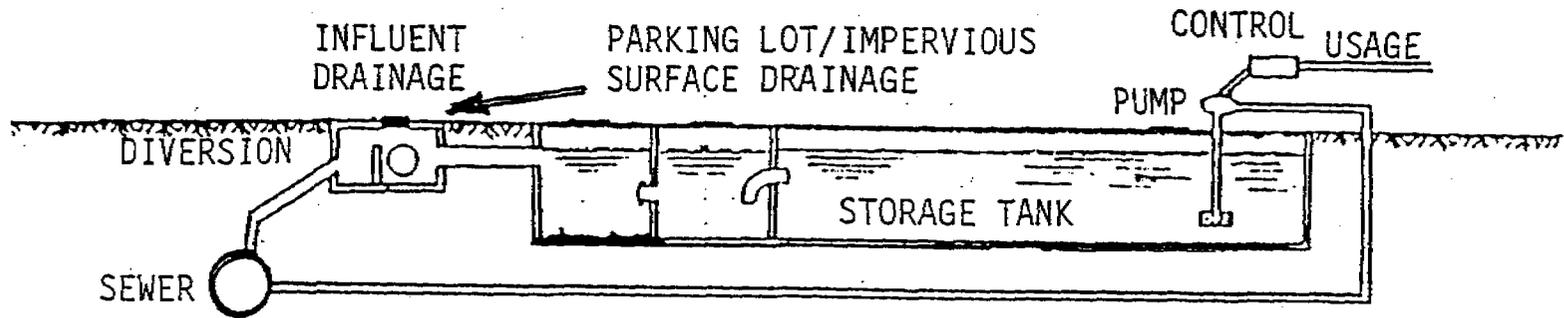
RAINFALL-RUNOFF WATER HARVESTING FACILITY FOR PARKING LOT/IMPERVIOUS SURFACE DRAINAGE
